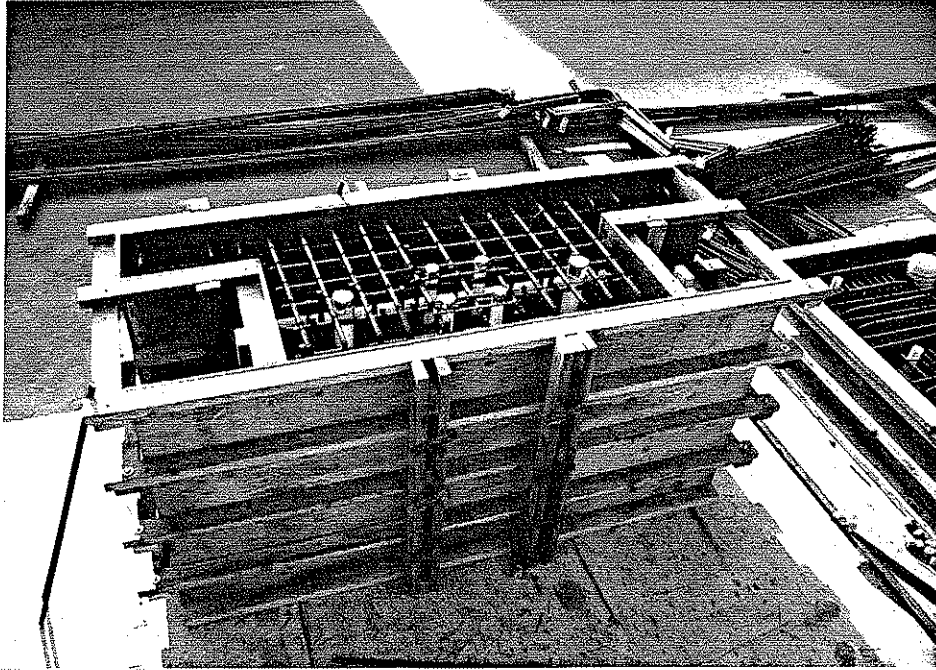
Formwork and steel reinforcement for the reaction block prior to casting.
